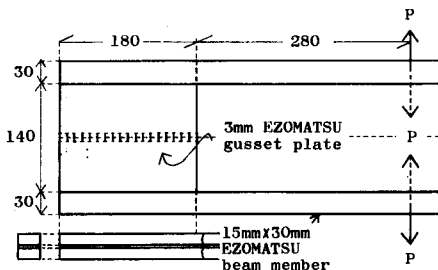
Test specimen of rectangular plywood gusset. (unit: cm)
